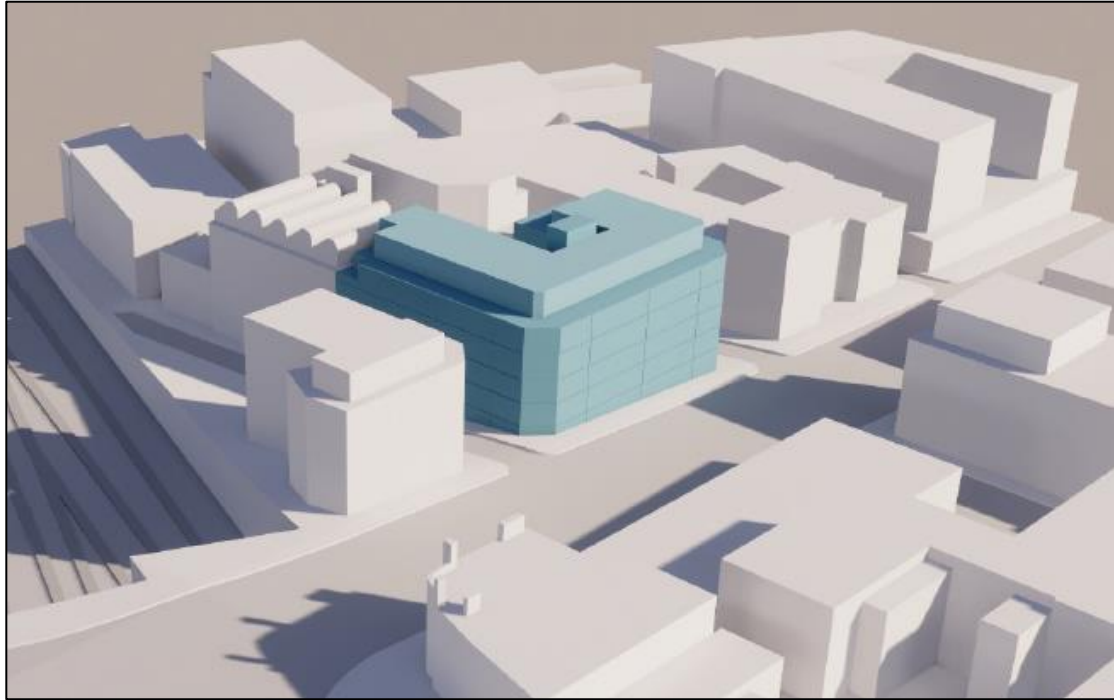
Proposed Massing Viewed Along Cleveland Street Looking South West
